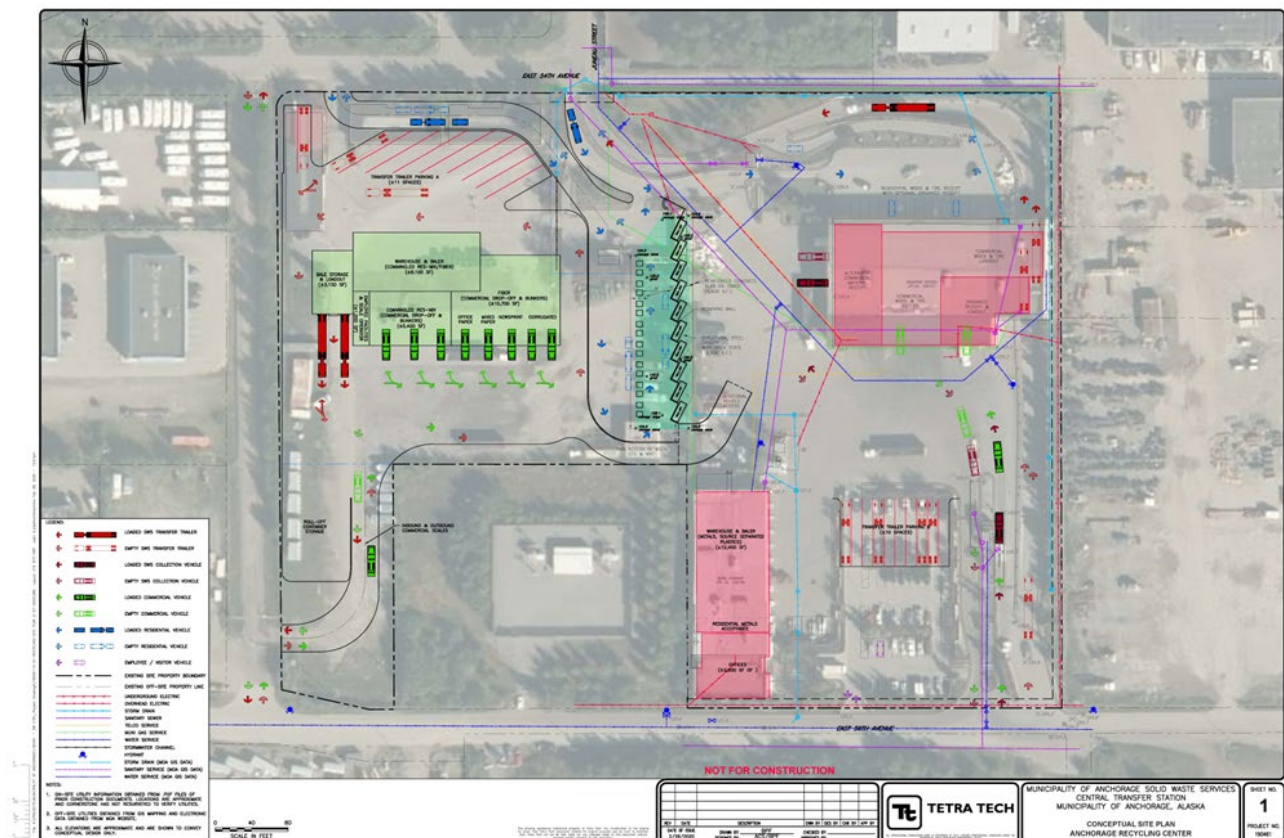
Proposed Anchorage Resource Recovery Center Conceptual Site Plan
